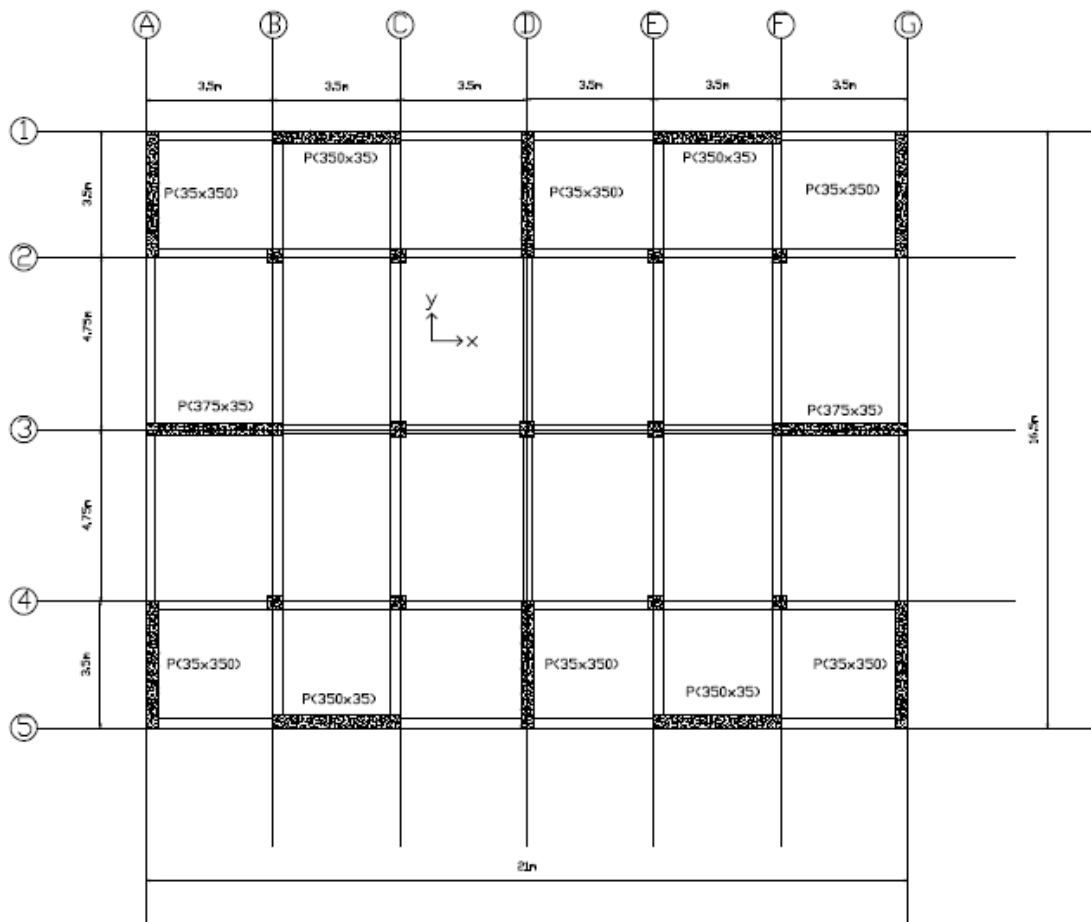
Plan of Model 10 with 2.0% Wall Area to Floor Area Ratio in Each Direction
